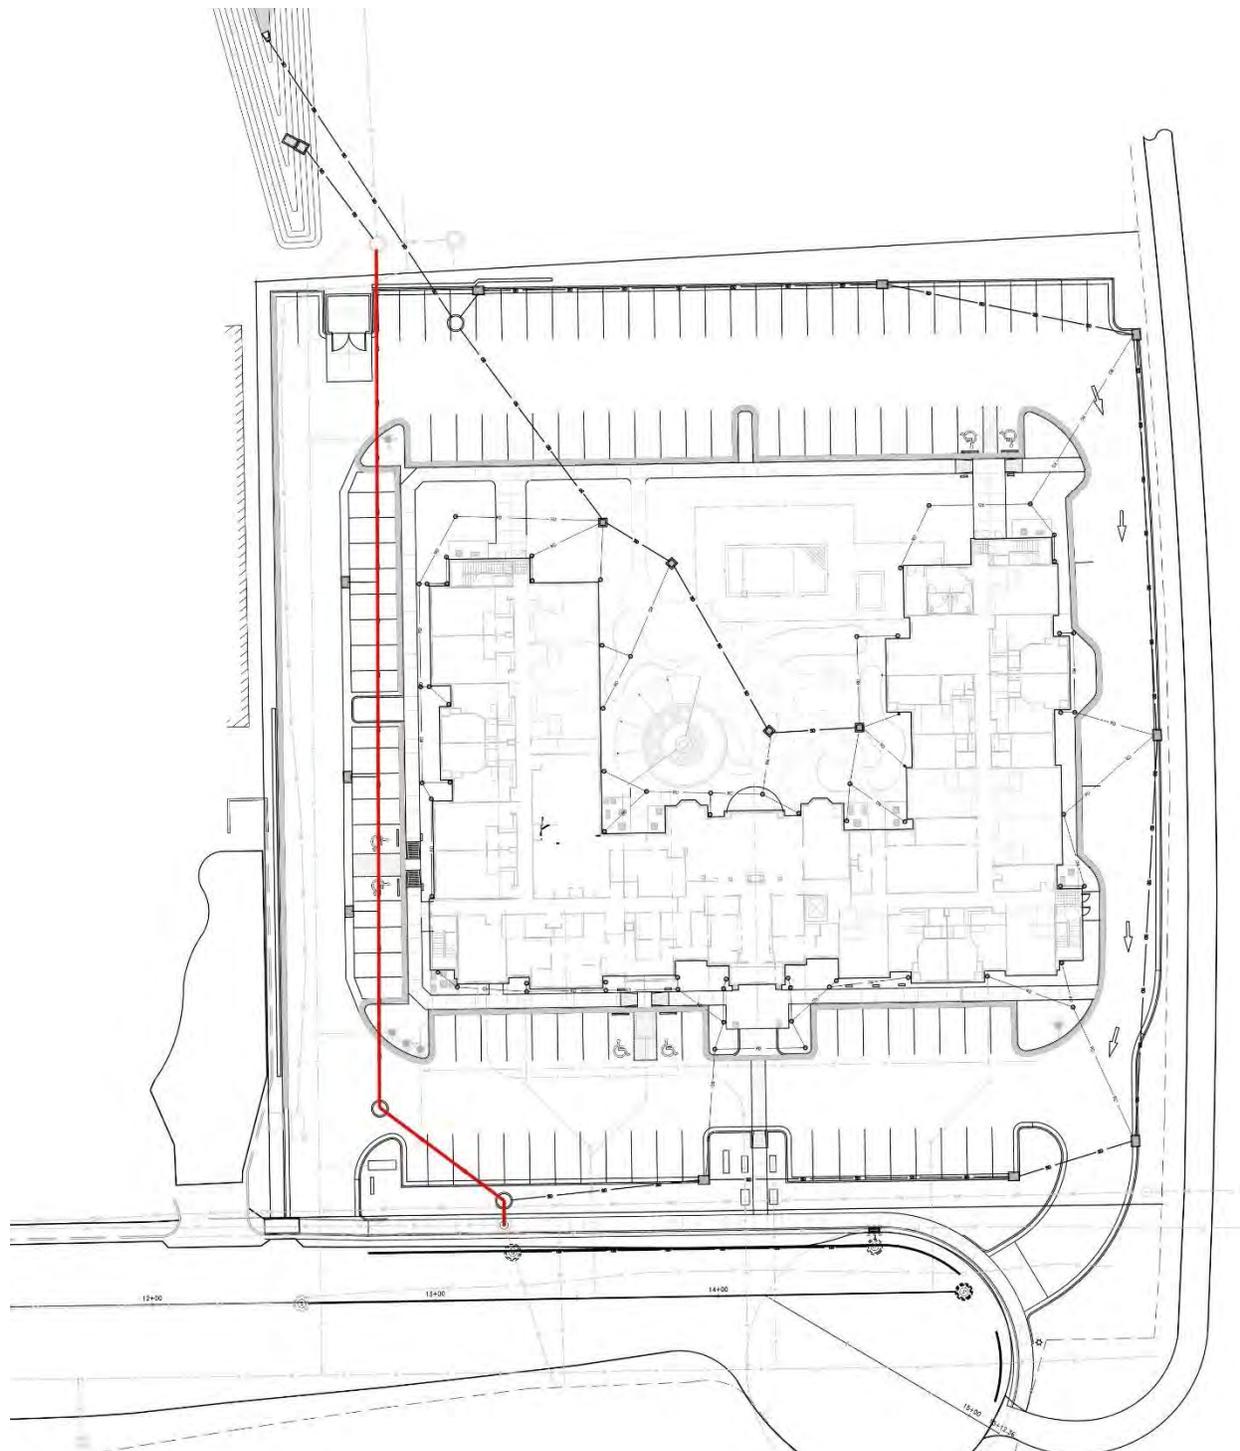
Conveyance Route of off-site Drainage through Staybridge Lot
